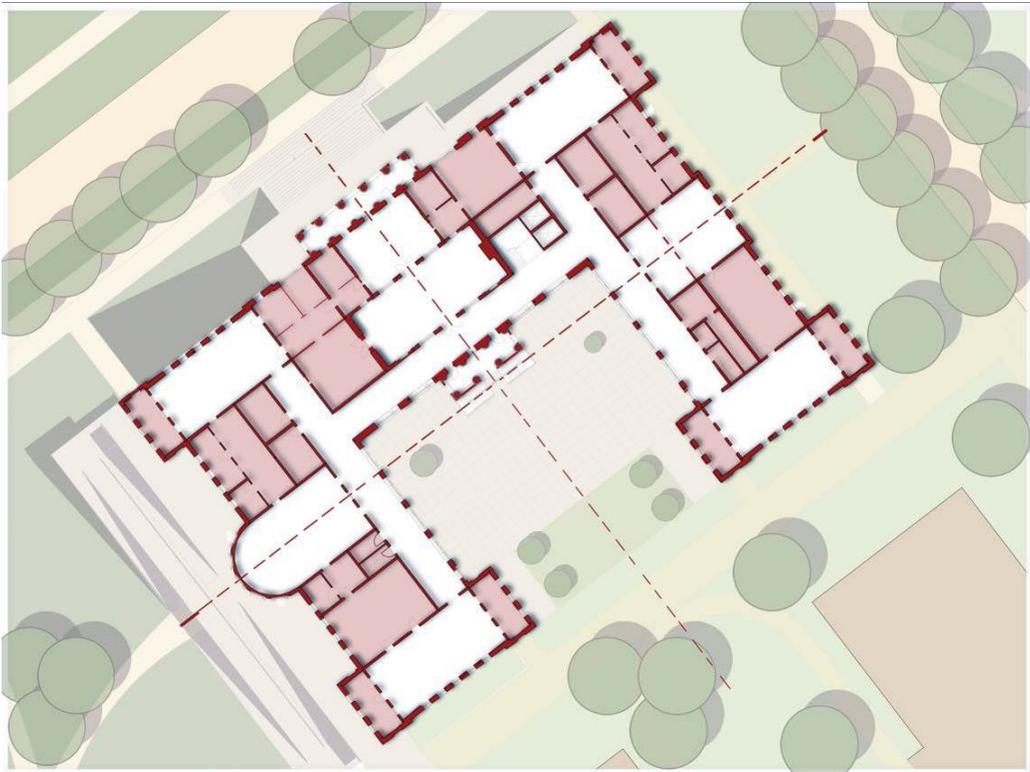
WFU Architecture School: Typical Upper Floor Plan (source: Author)
